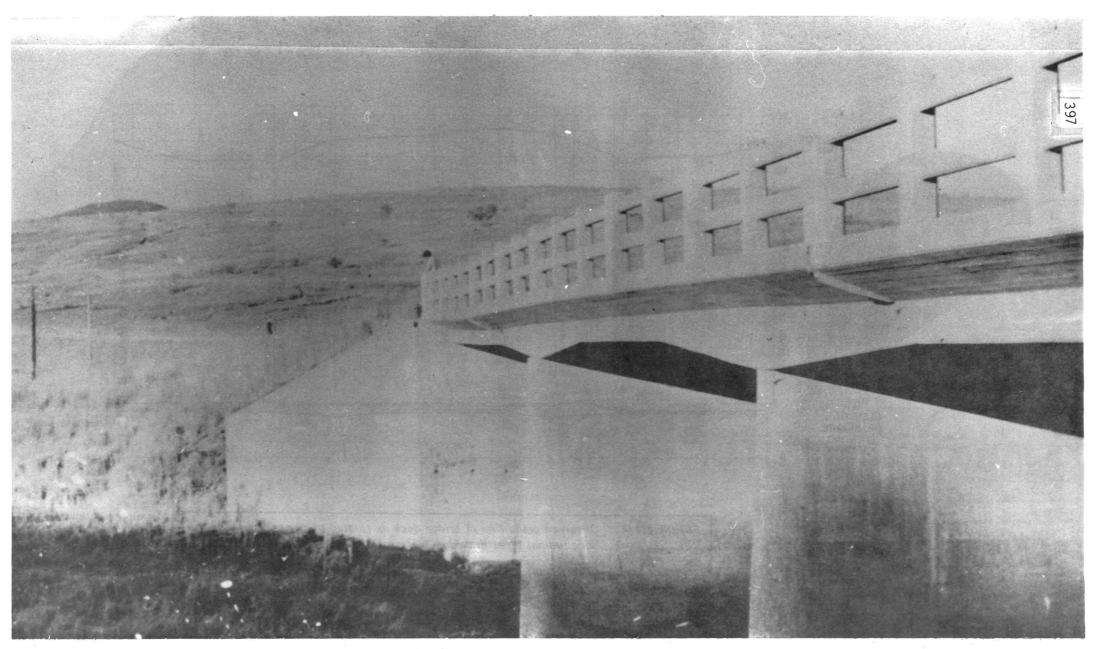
/5 ; Bridge over Umzimhlava river near Mount Ayliff
